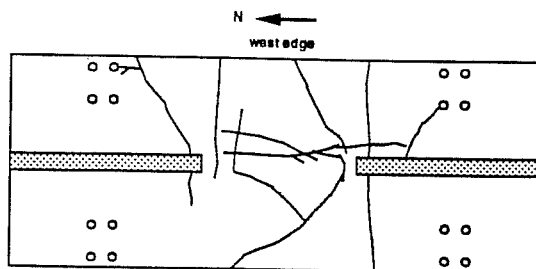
Sp. 2b: Progression of Cracking of Bottom Face of Second Floor Slab at End of Test
